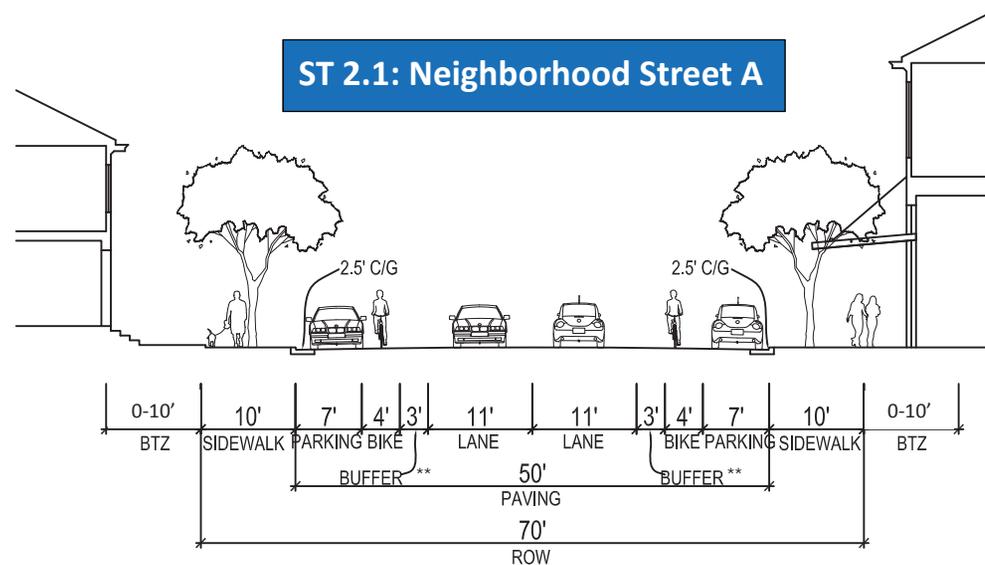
Street Type 2.1: Neighborhood Street A
